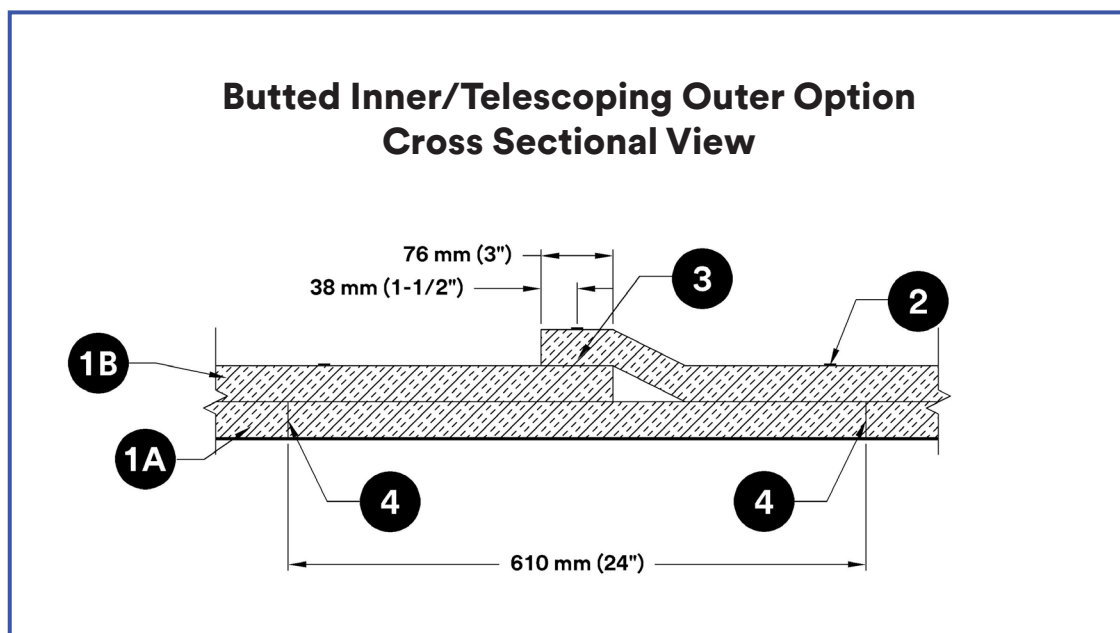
Butt joint inner layer with telescoping outer layer installation method
